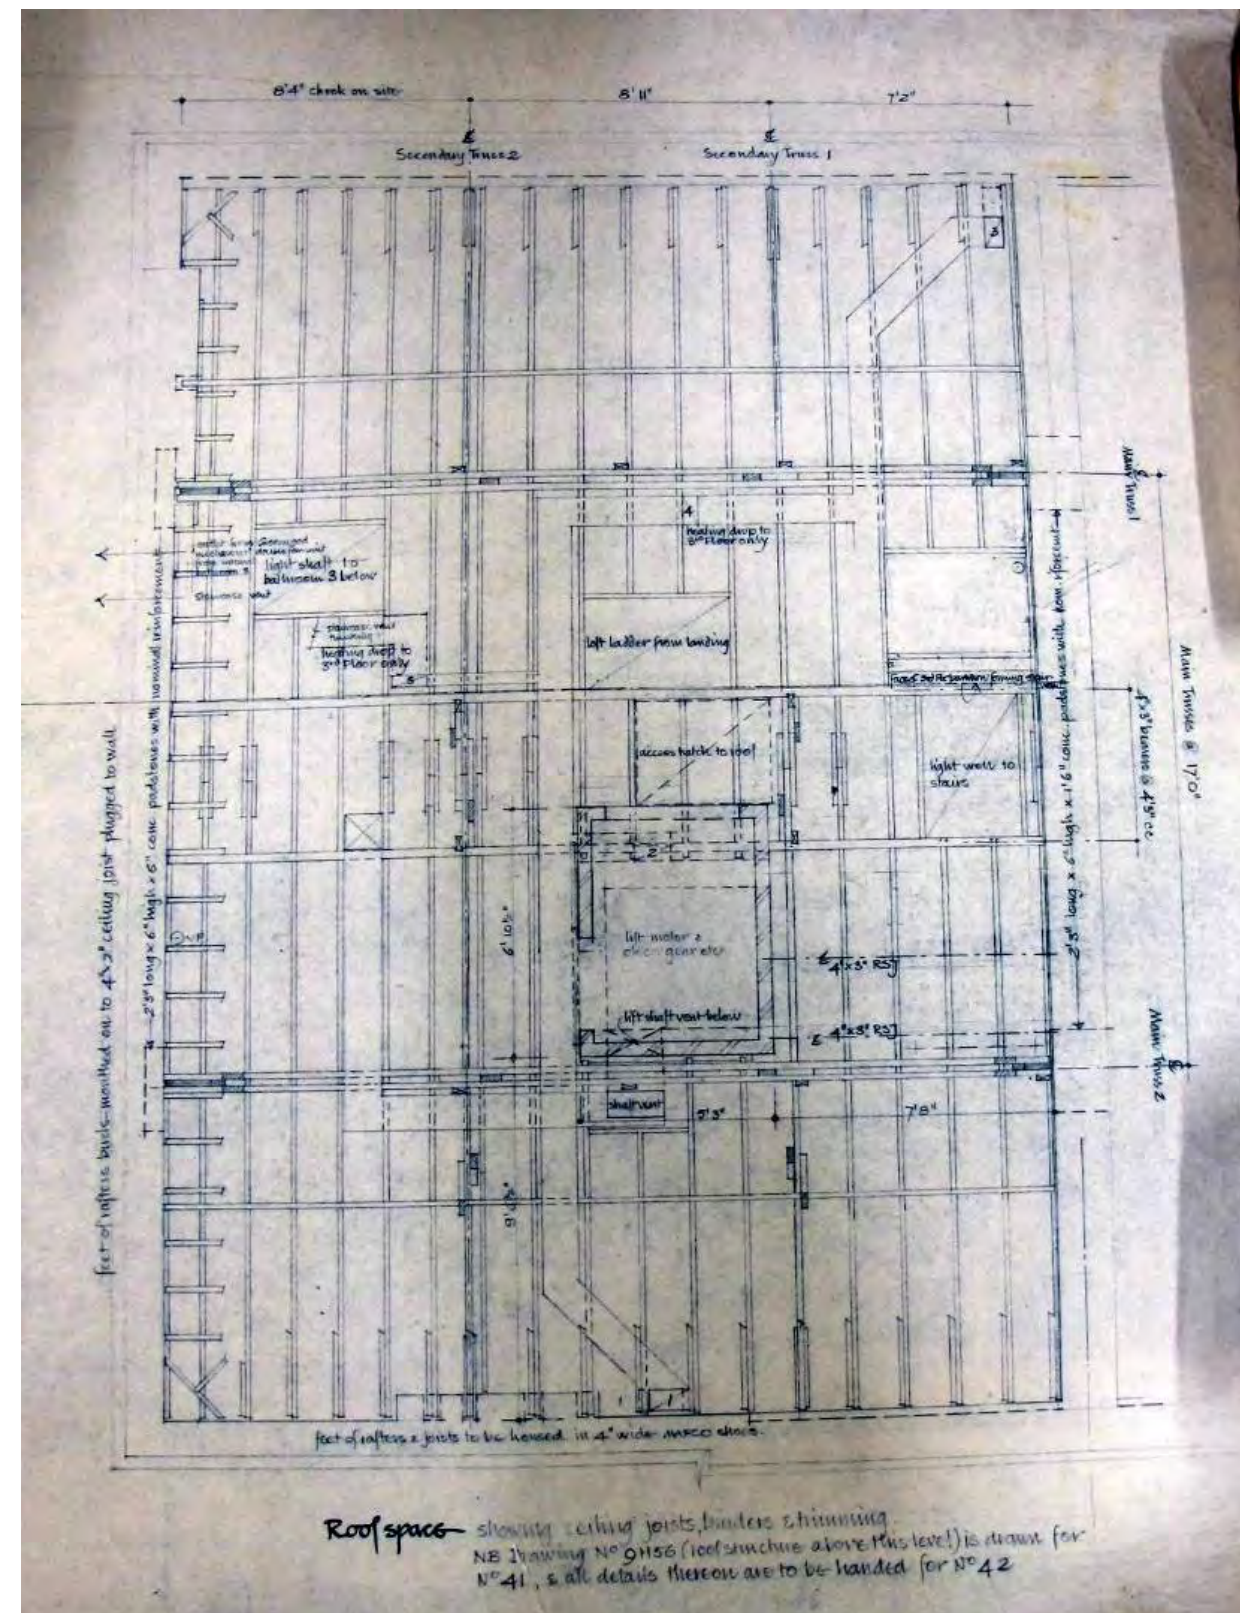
1961 drawing showing roof-replacement for Nos. 41 and 42, indicating installation of the lifts.
